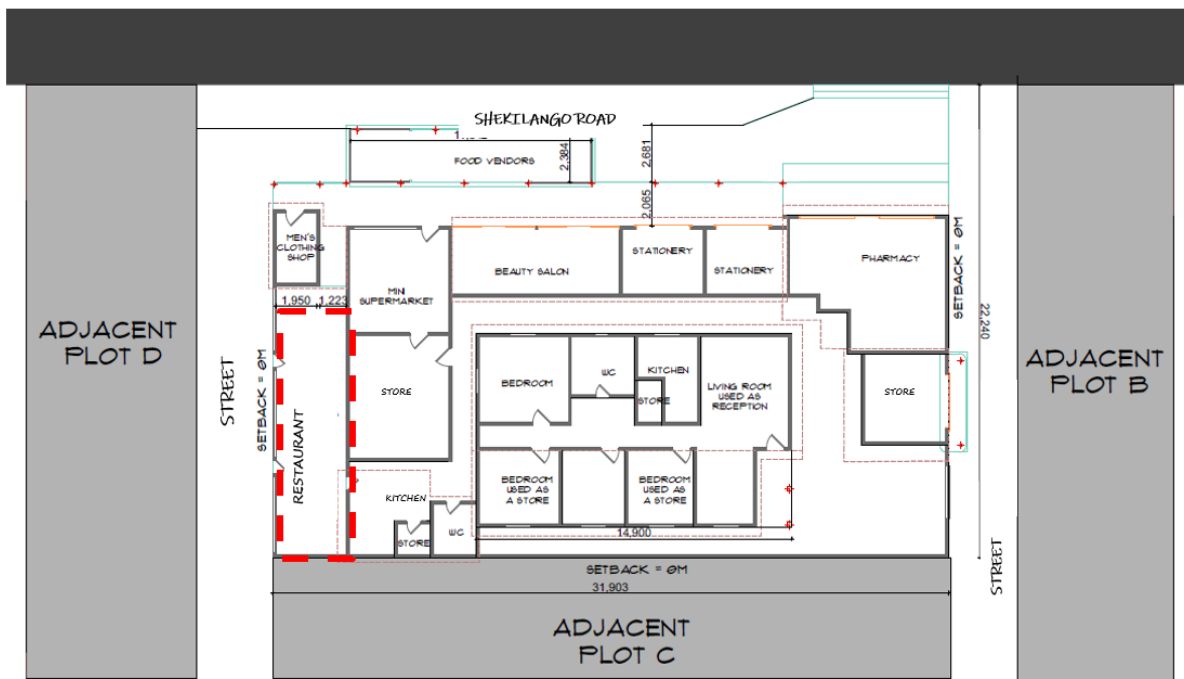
Layout plan of a mixed-use plot (source: author, fieldwork 2020).
